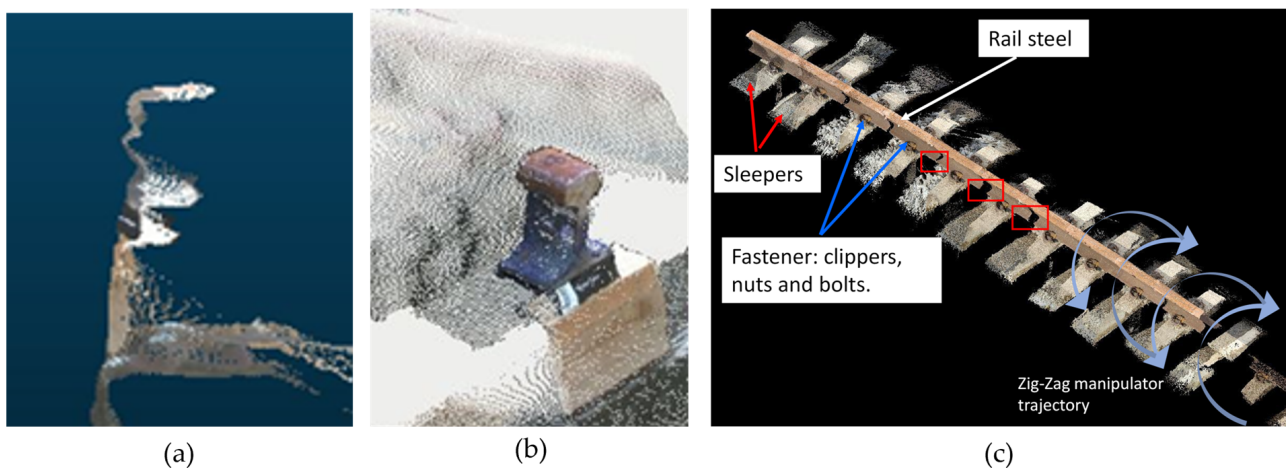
Reconstructed 3D model of railway track components; (a) distorted side view of a rail section from RGB-D camera (b) reconstructed 3D model using proposed technique (c) reconstructed 3D model of a railway track section using mobile manipulator and SfM technique [148].
